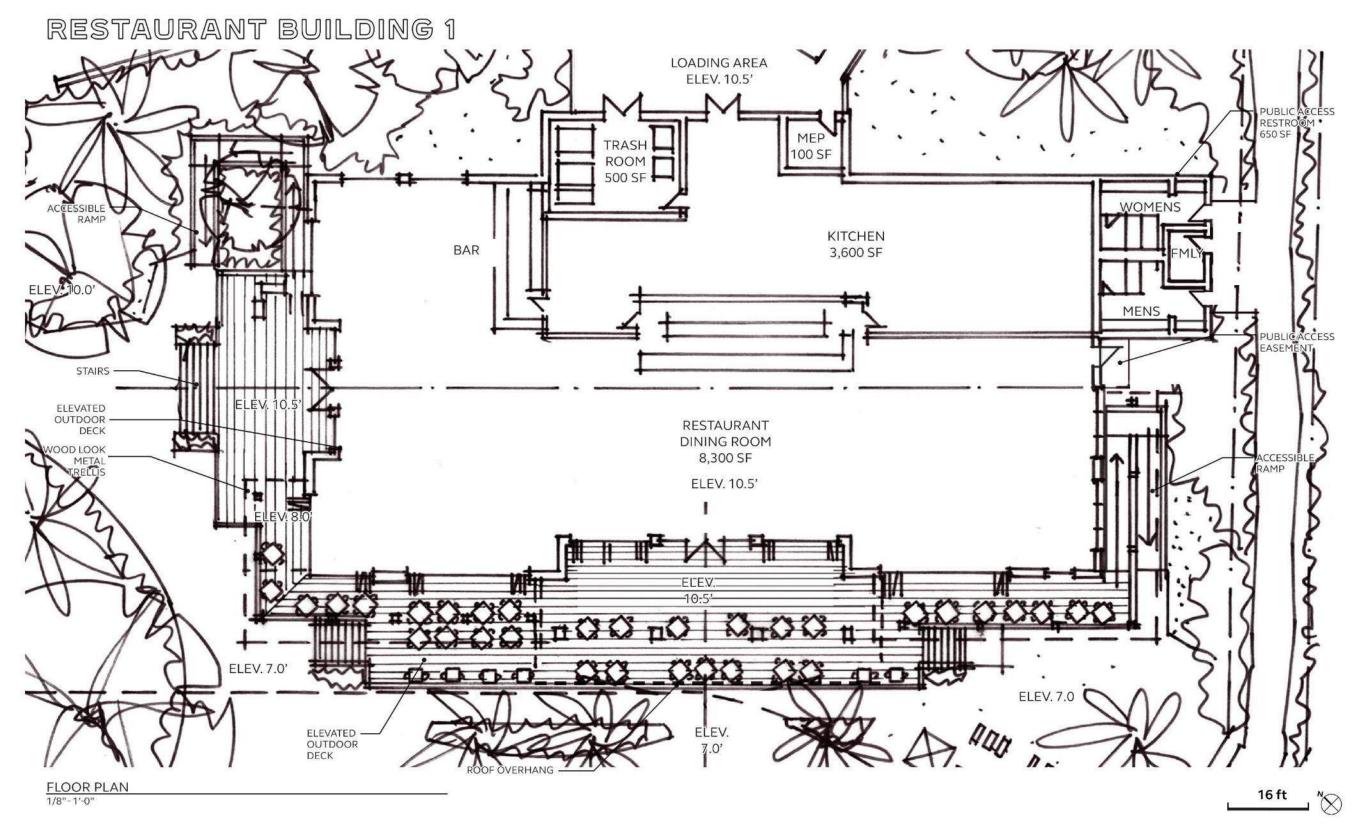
Restaurant Building 1 – Preliminary Plan
